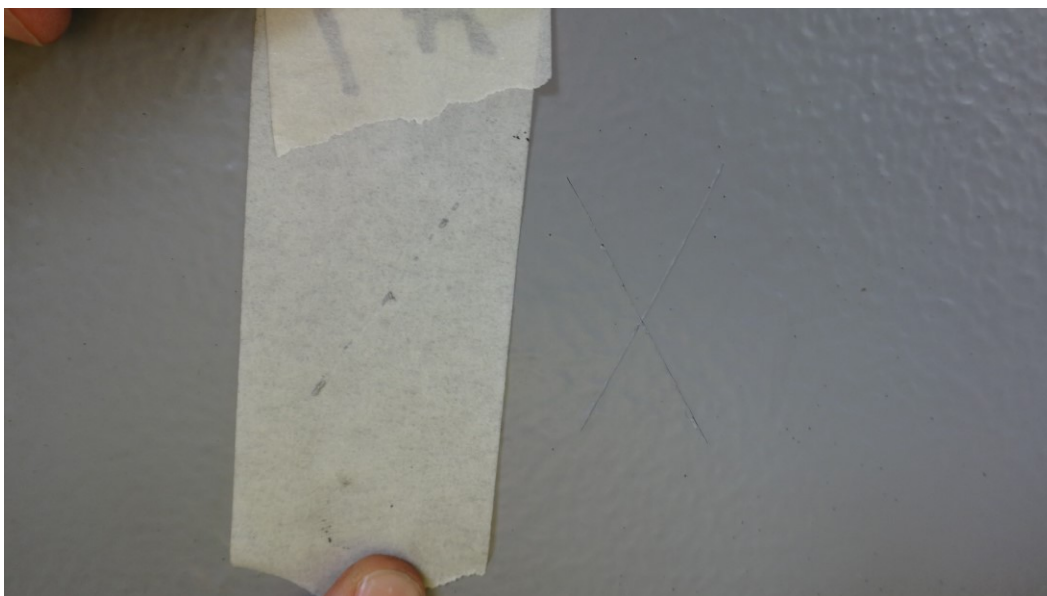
Test Location 1 Adhesion Test A7- Flange
